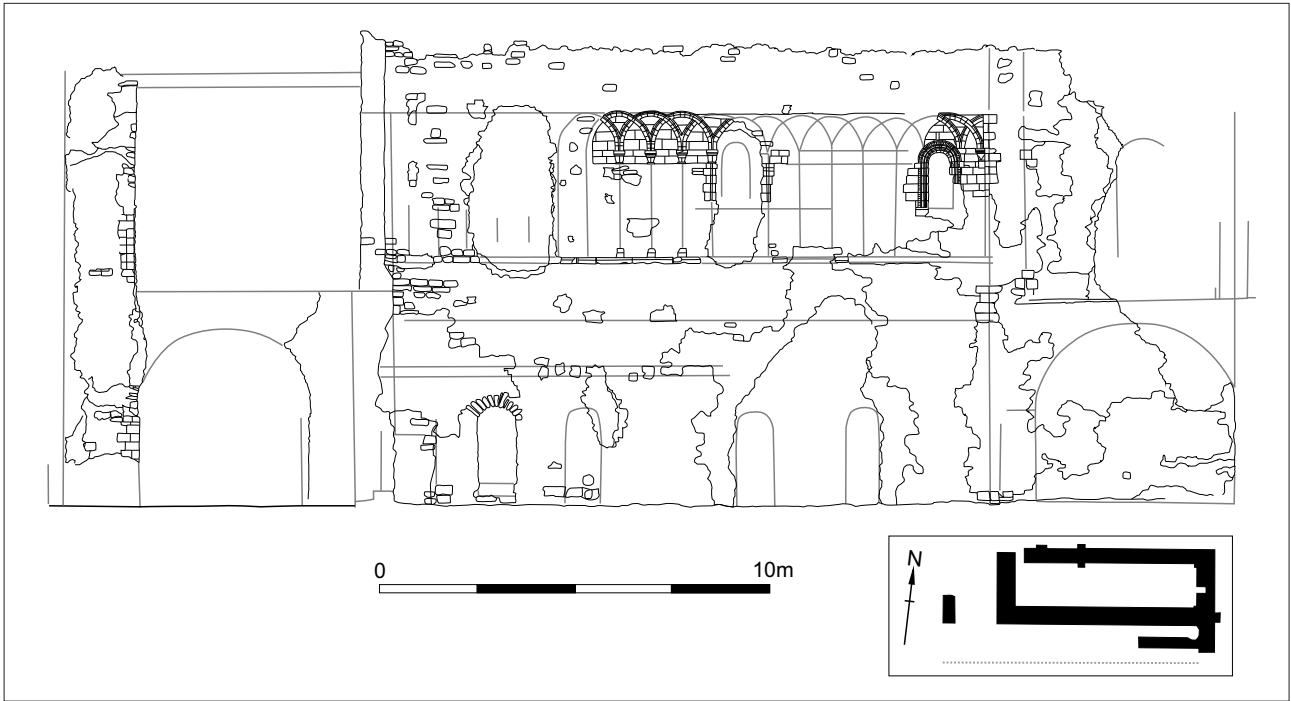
Reconstructed external elevation of the south wall of the north range, c 1135
